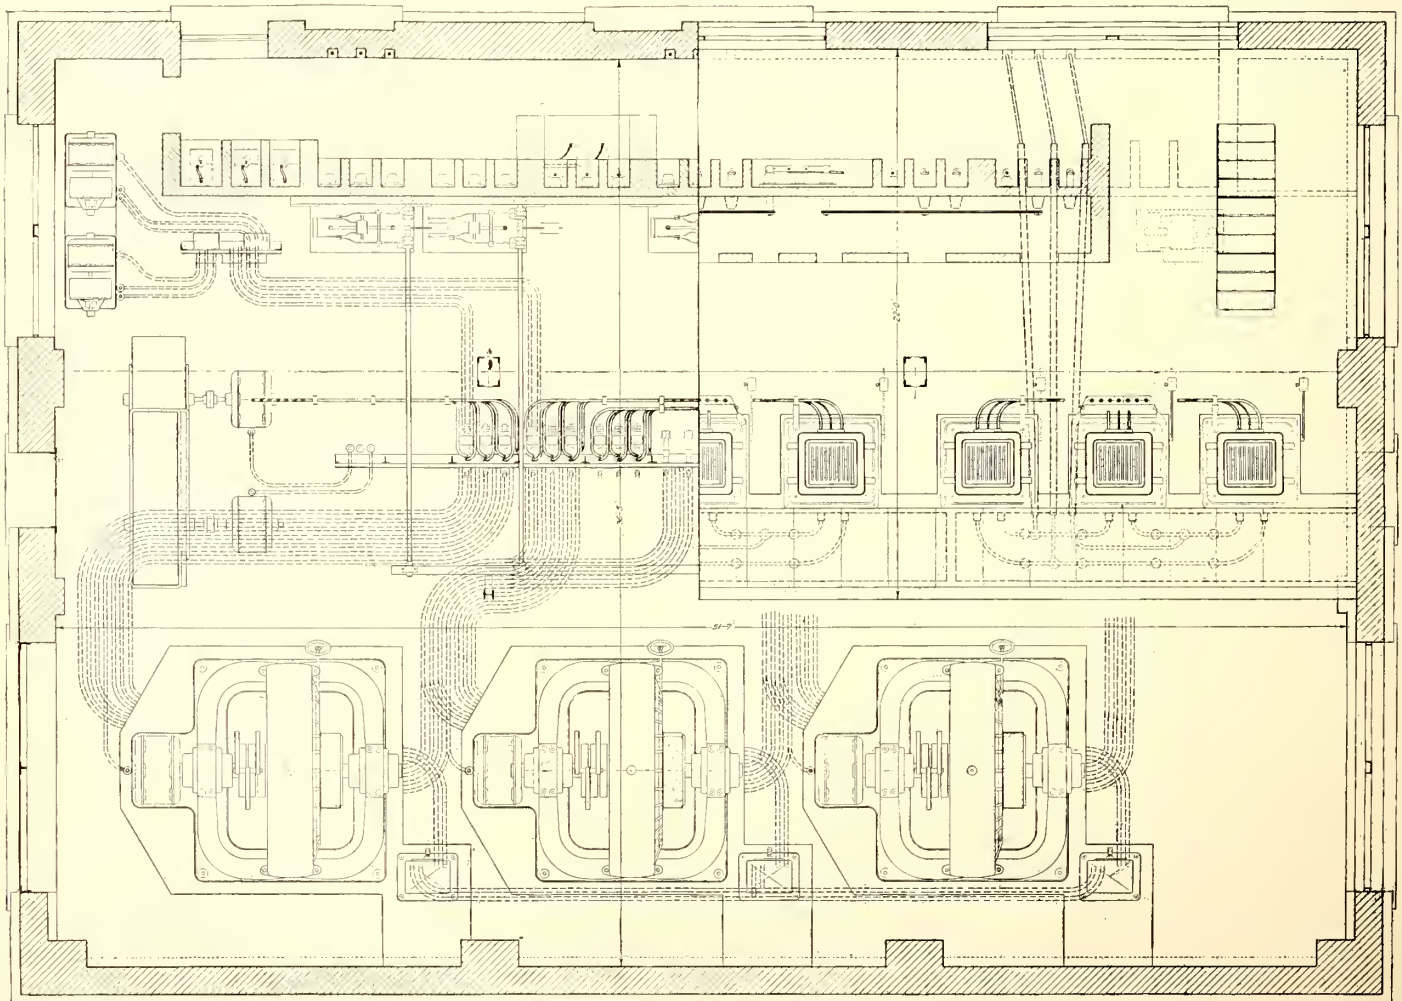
SECTIONAL PLAN, PUTNEY SUB-STATION
